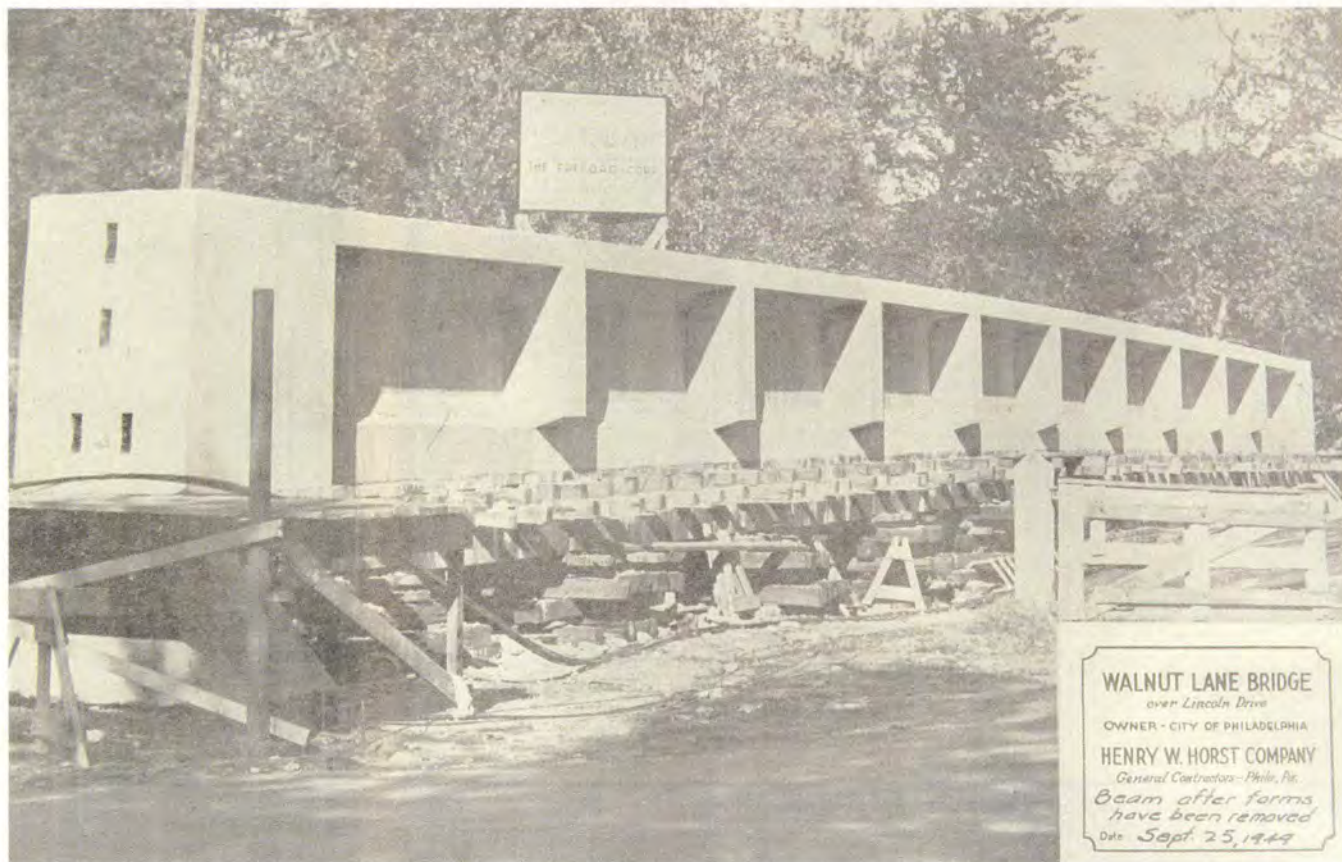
Appearance of the first test girder after removal of the forms. Note that diaphragms were cast as part of the main span girders.
